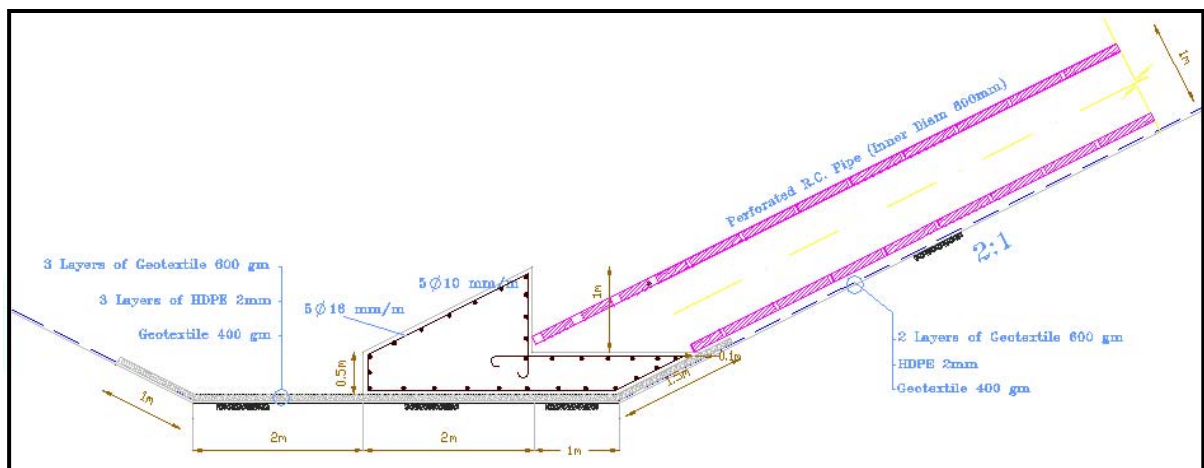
Connection of Leachate Collection Pipe with the Trench for a Typical Cell
